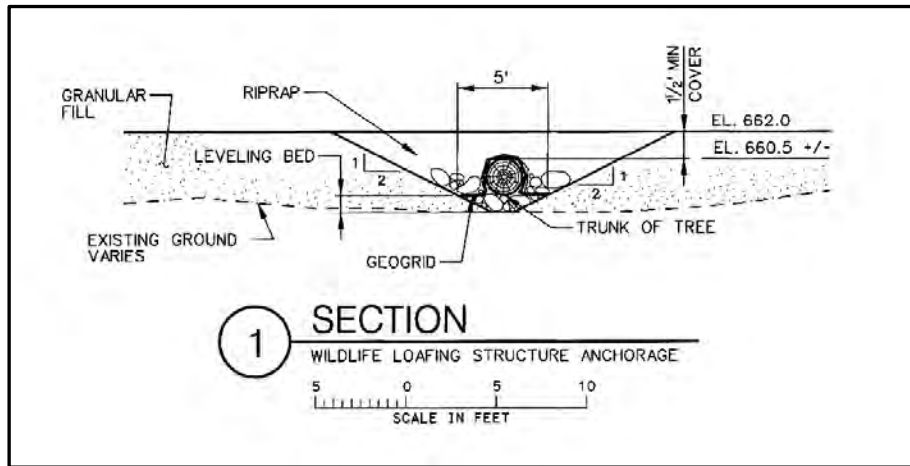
Design Detail of Large Woody Debris Anchorage
